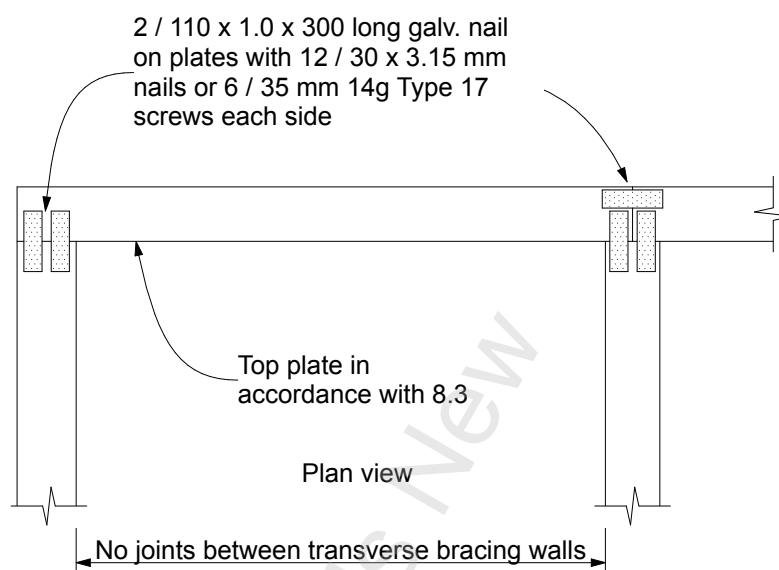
Connection of timber bond beams or top plates without structural diaphragms (plan)
